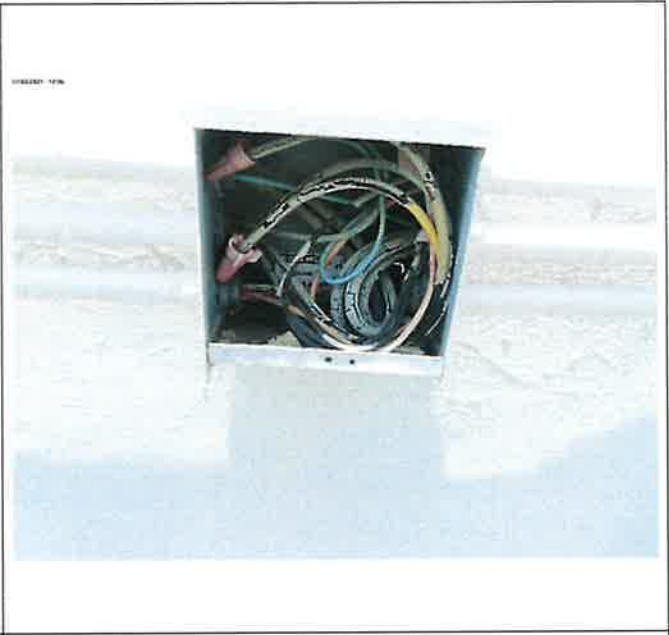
Opening in junction boxes/enclosures (Item #10.f.1)
